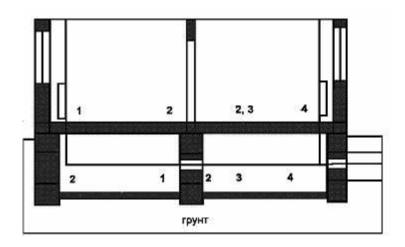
The main ways of radon entering the building: 1 – isolation from the materials of enclosing structures; 2 – seams and joints between elements of enclosing structures; 3 – cracks and voids in the enclosing structures; 4 – openings for building utilities in the underground part of the building and basement floor (author's material).
